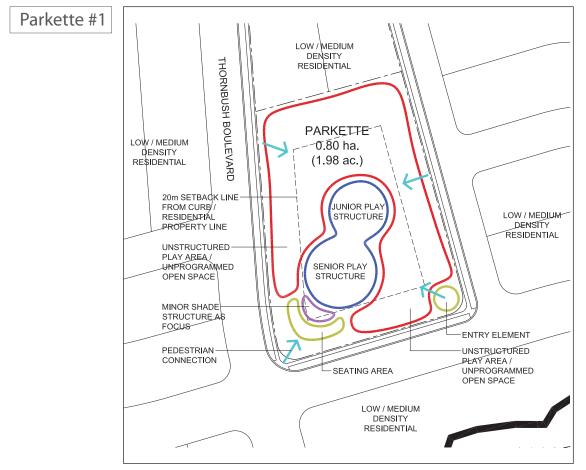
Parkette #1 conceptual facility fit diagram (detailed design of the park will be determined at the subdivision landscape drawing review stage).
